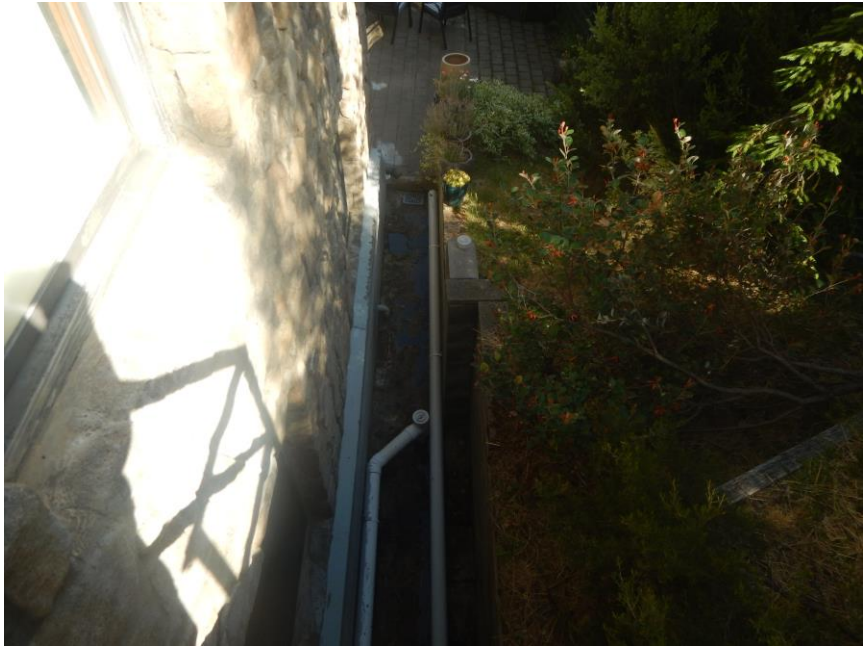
Photo of the concrete drain and services below the proposed extended deck
